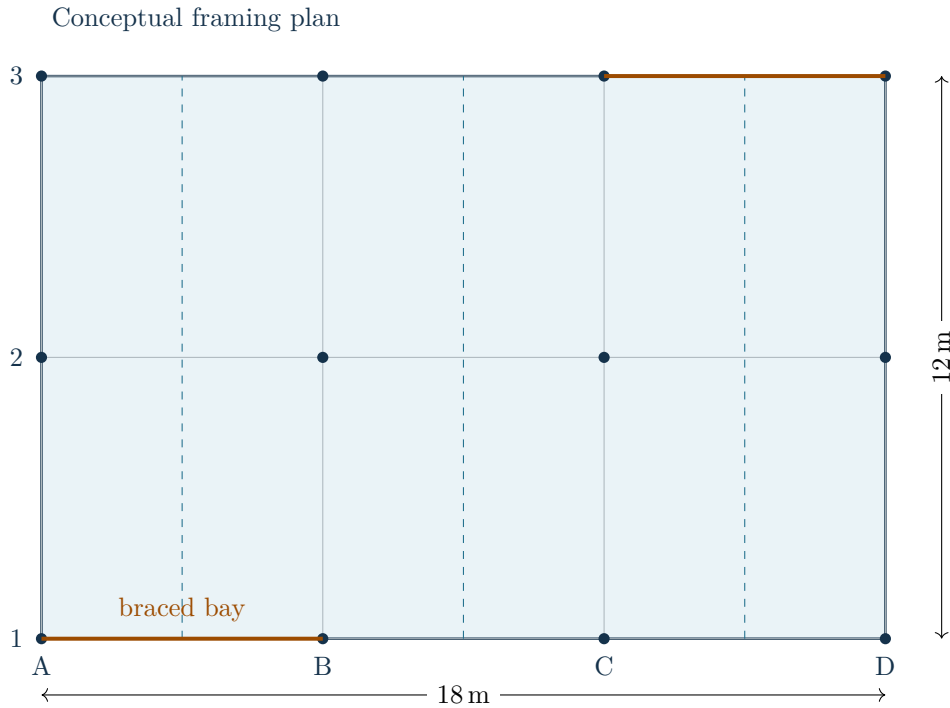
Assumed plan grid; dashed lines indicate secondary beam lines.
